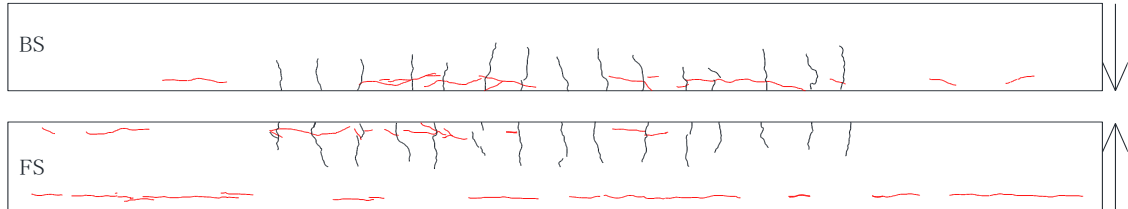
Cracking situation on C2 beam at 29 months
